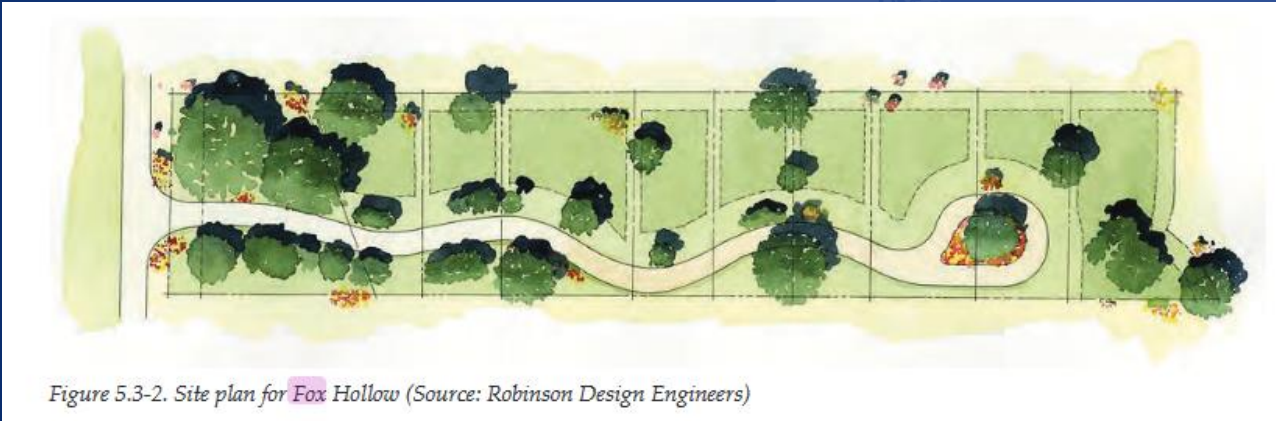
Site plan for Fox Hollow (Source: Robinson Design Engineers)
